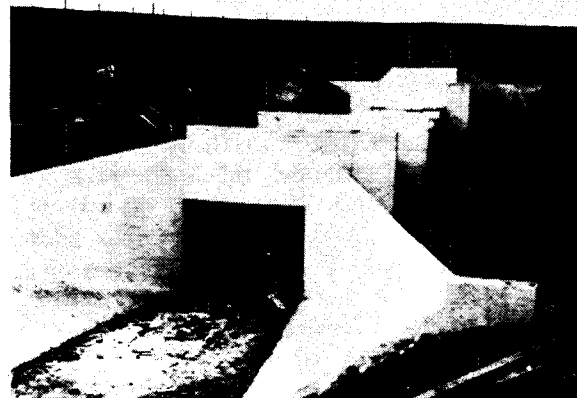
Concrete box culvert with concrete percolation collars. P328-701-3743
